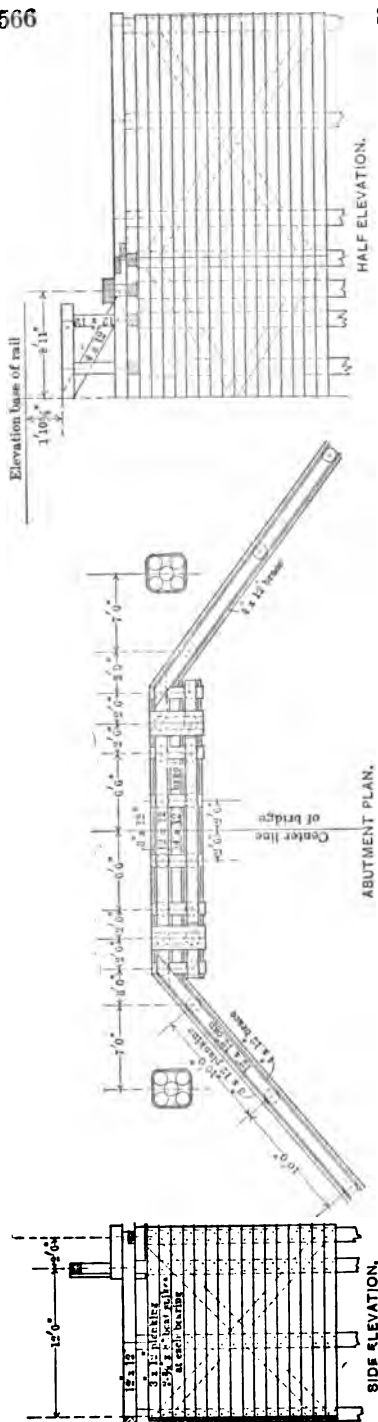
PILE PIER, PUGET SOUND ELECTRIC RAILWAY.
